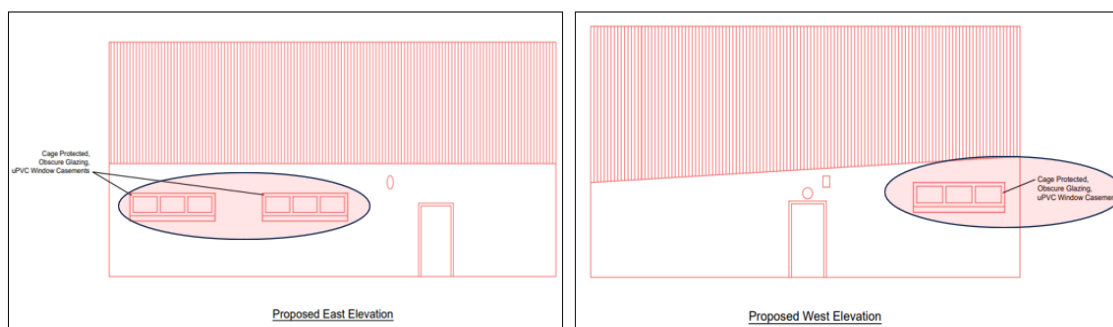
Eastern and Western Elevations as built (Drawing Nos. 03/202207/TN - East Elevation - Sports Hall and 03/202207/TN - West Elevation - Sports Hall).
